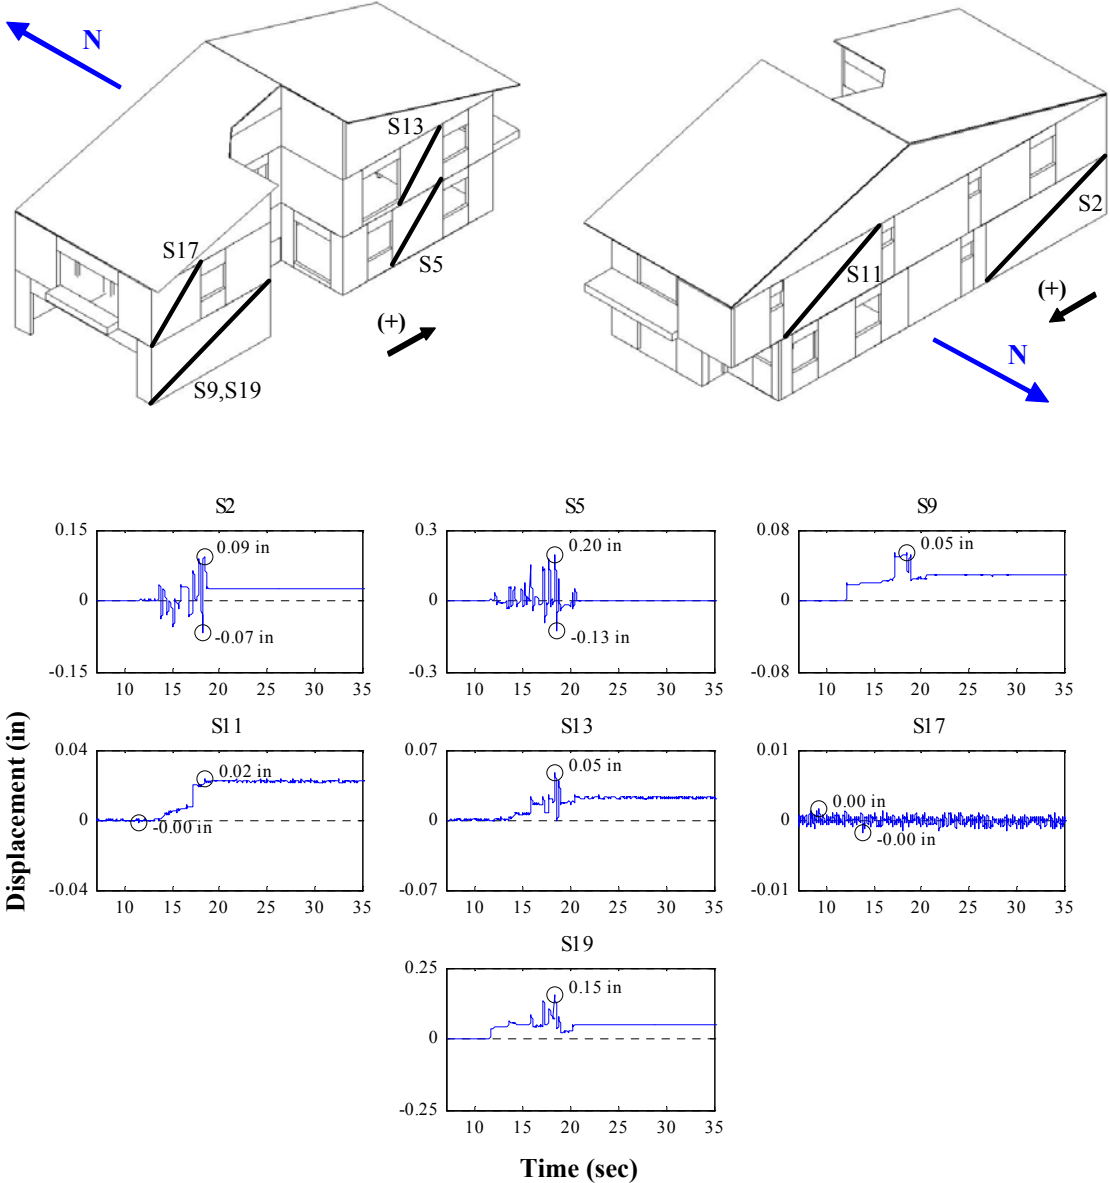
Wall deformations of east-west external walls for Test NWP4S04
